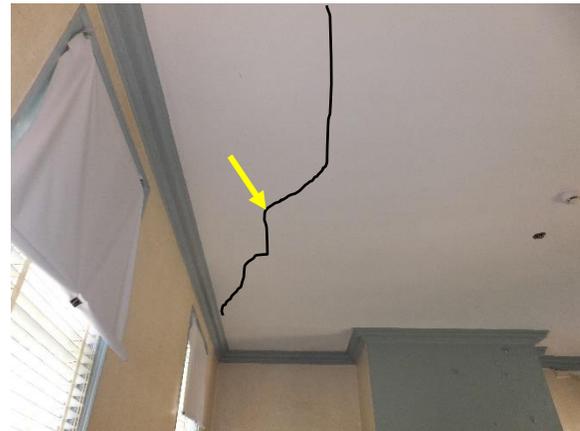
Cracking in plaster ceiling. Crack traced for clarity.
